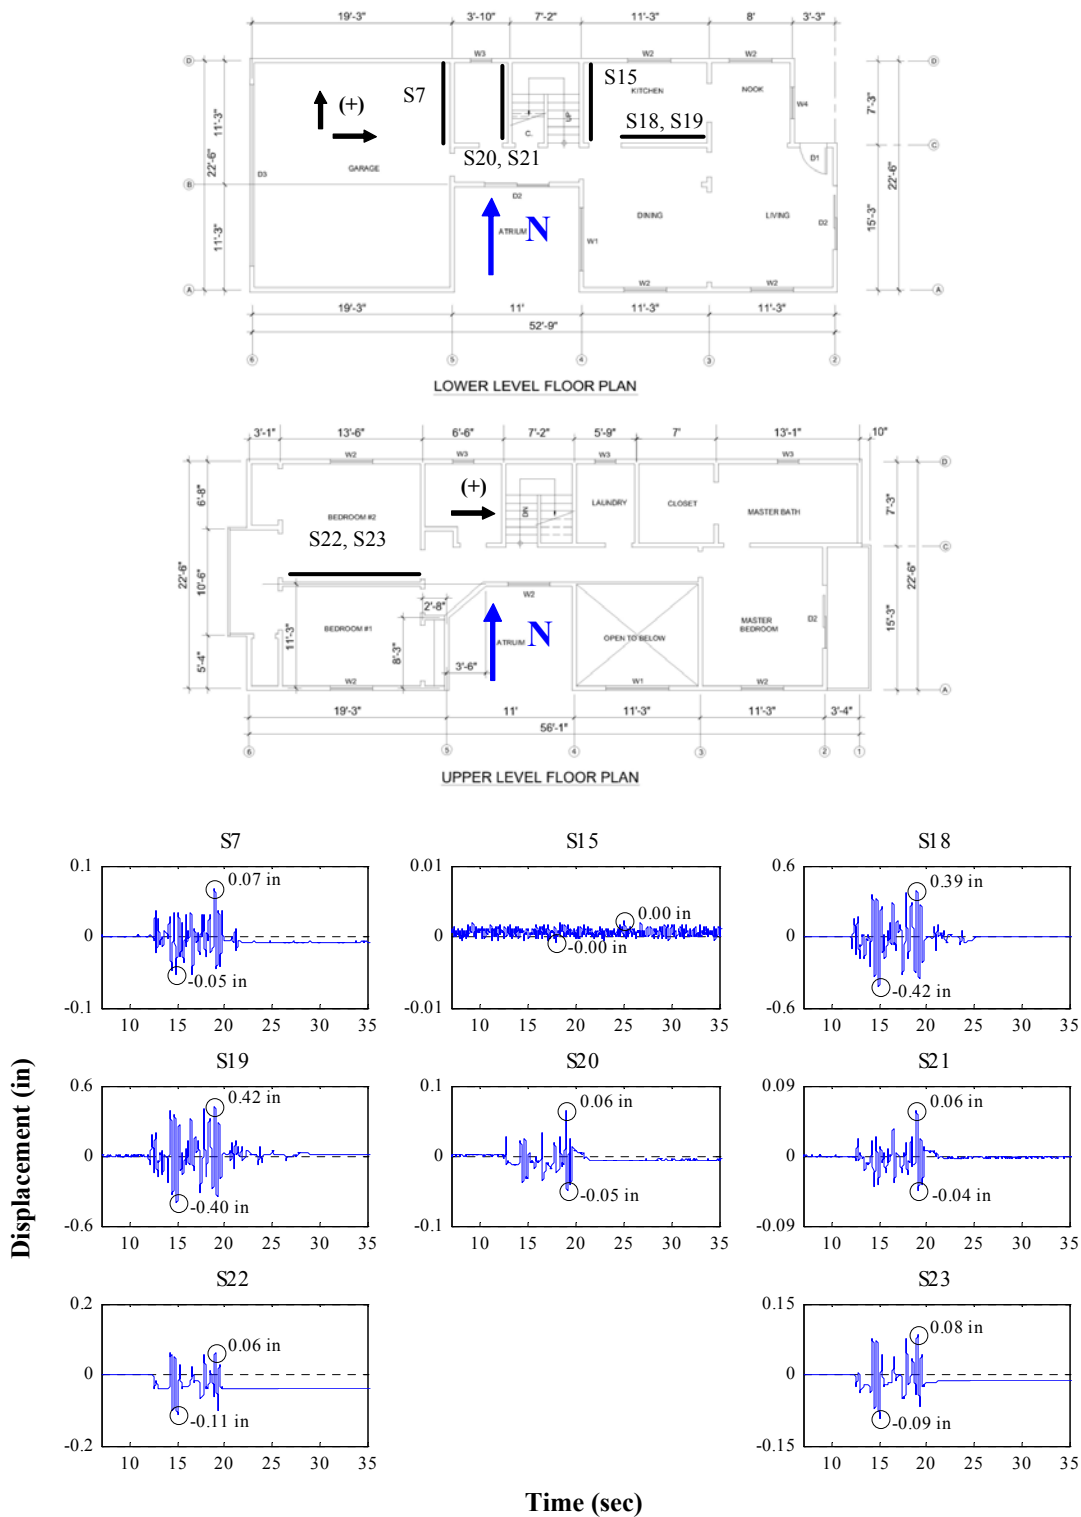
Wall deformations of internal walls for Test NWP1S10
